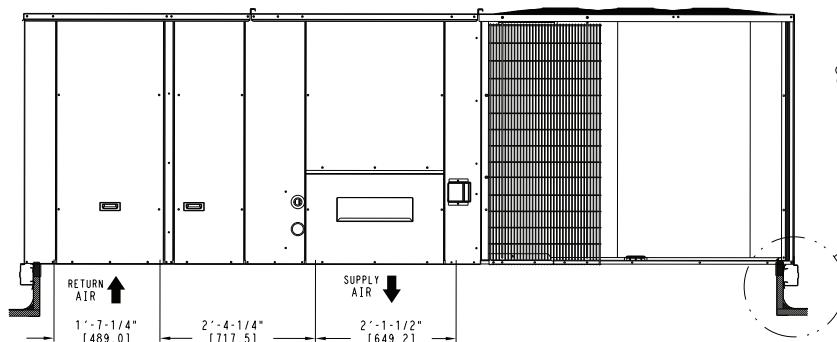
Roof Curb Details - 17 and 20 Size Units
